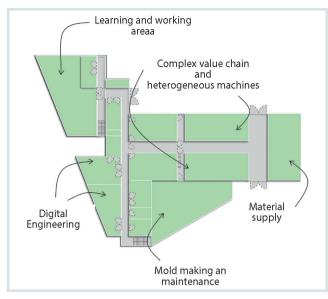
Planned room allocation on the ground floor of the PIC 4.0 © IKV
